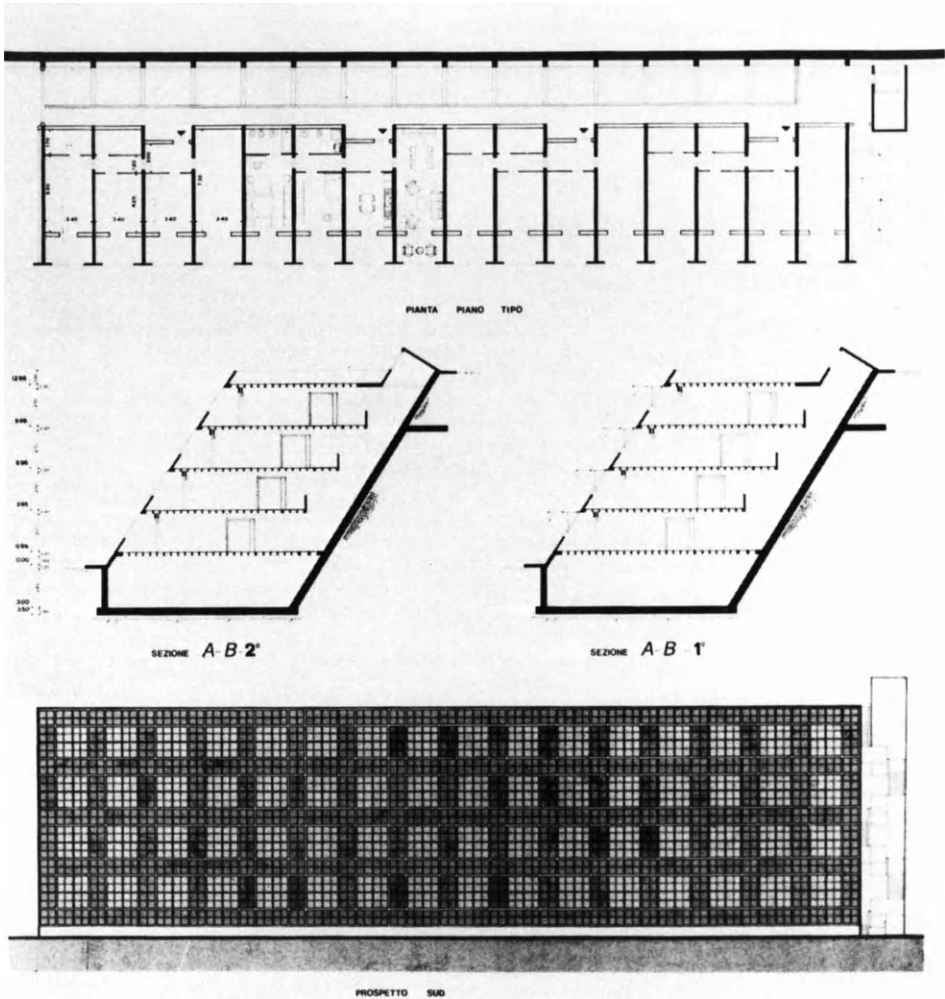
Plan, sections (winter and summer operation) and south elevation of the building.
